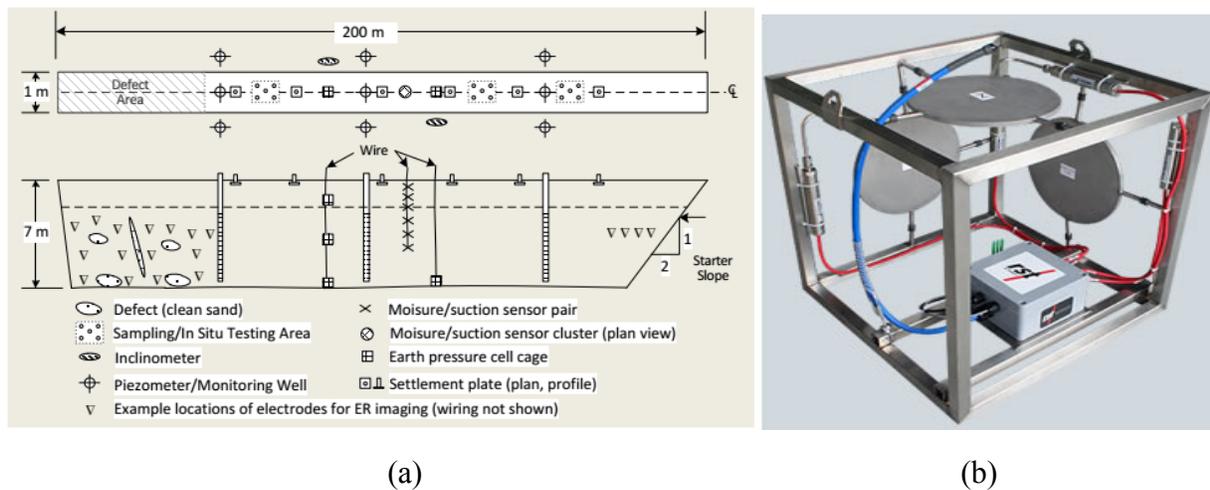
(a) Plan and cross-section of SB wall with instrumentation. (b) Instrumentation cluster.
